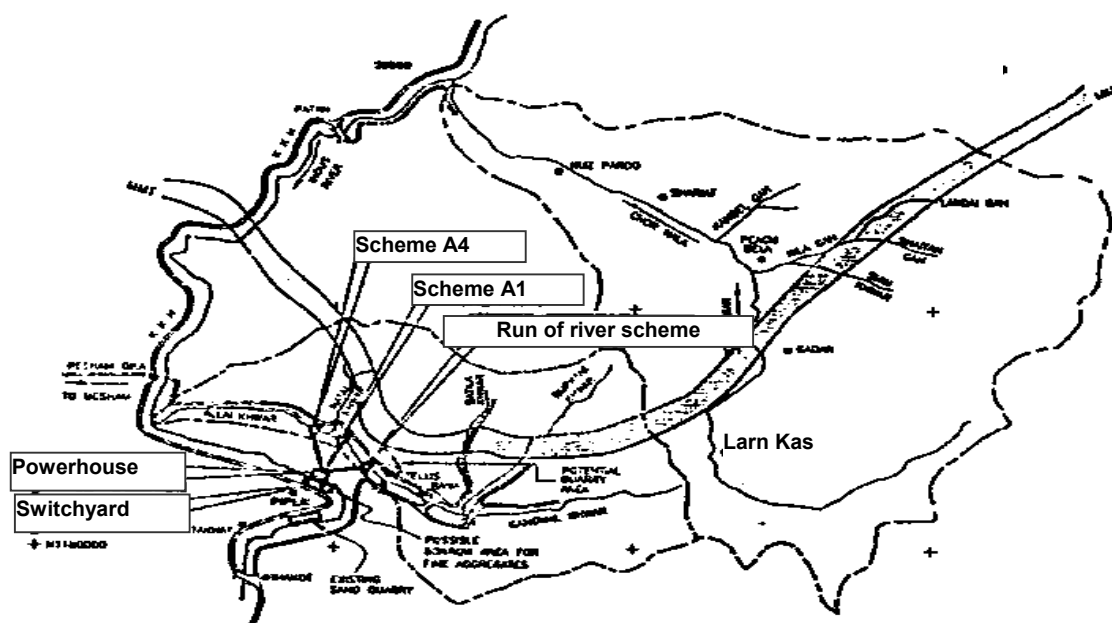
Allai Khwar HPP-Layout and Infrastructure Plan
